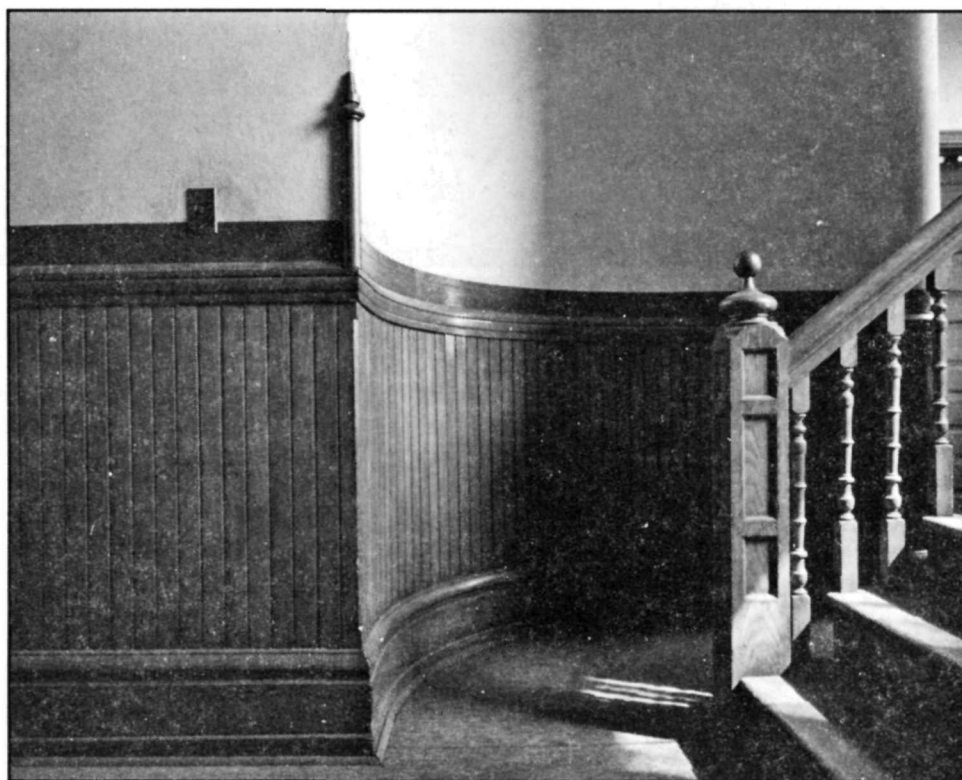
Masonic Temple, interior, detail of third-floor wainscoting and stair baluster.
